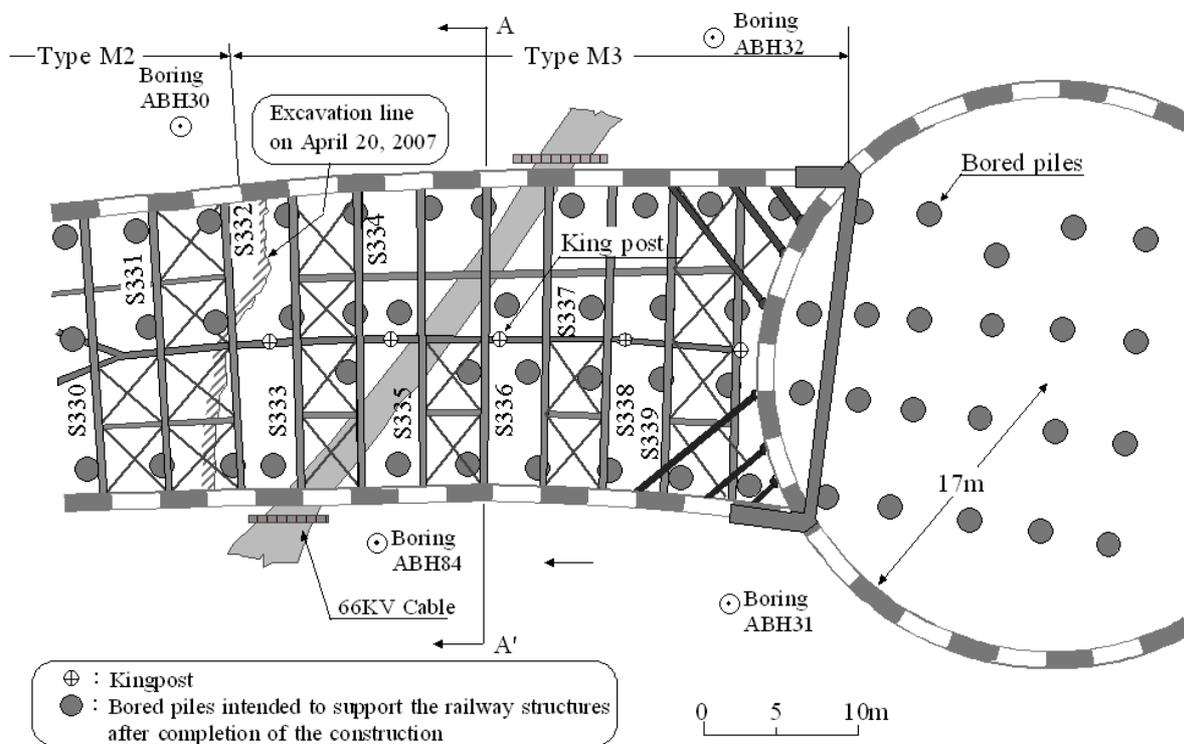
Plan view of the Type M3 section due west of the access shaft
